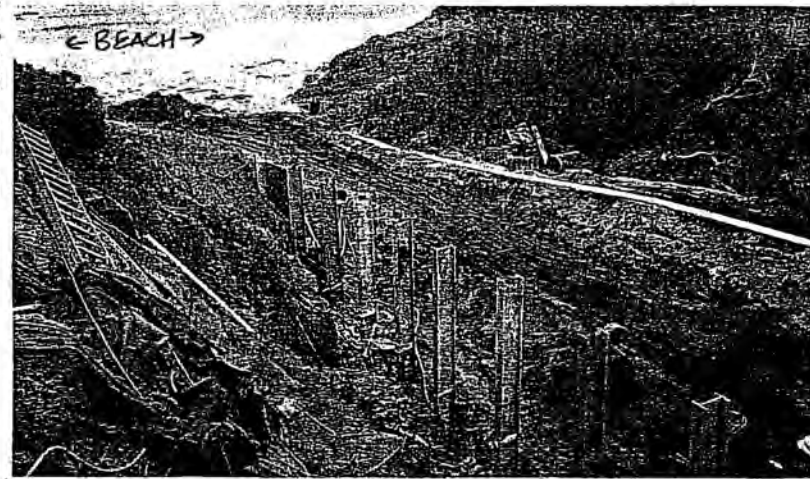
Central portion of Lower Retaining Wall Under Construction, August 1999
